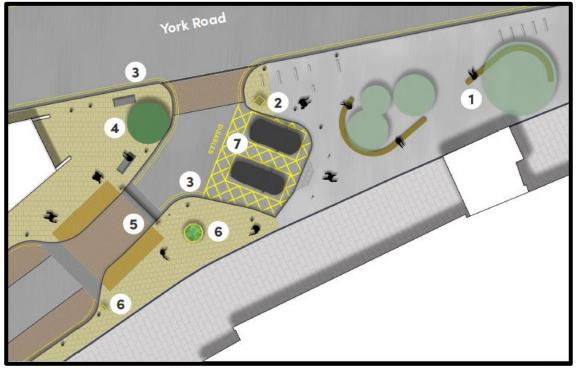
Concept plan: (1) replace old seats with long sculptural bench (2) retain cycle parking and introduce a new gateway sign; (3) remove some bollards and street clutter; (4) retain accessible benches and add new tree; (5) new wide raised crossing flush with the pavement; (6) new features such as wayfinding signage or large plant pots; (7) improve existing blue badge parking bays © PWP Design
